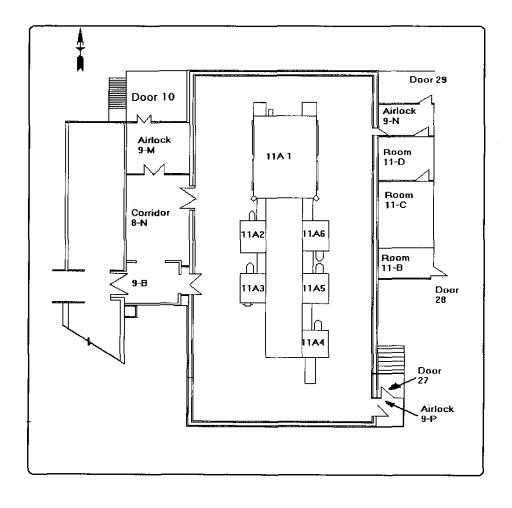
222-S LABORATORY LAYOUT OF THE SECOND FLOOR
